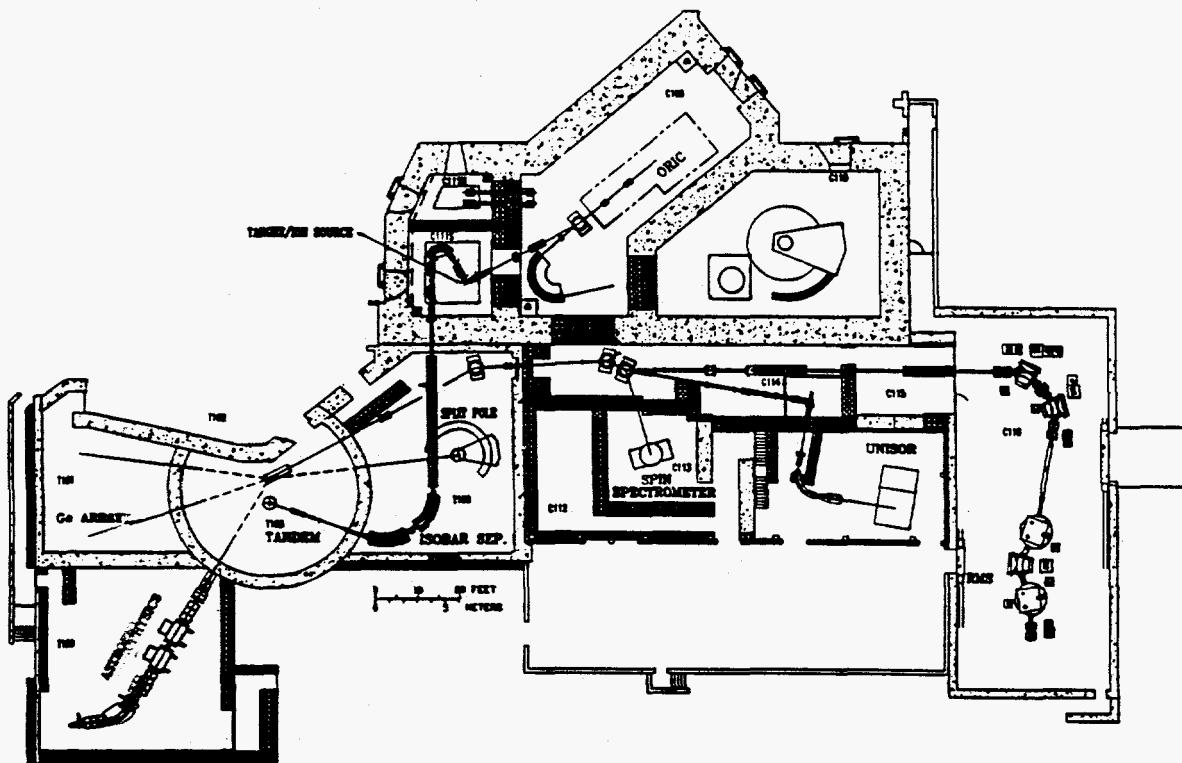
Existing HRIBF Building First Floor Plan and Initially Proposed Existing Target Room (Room C111).
